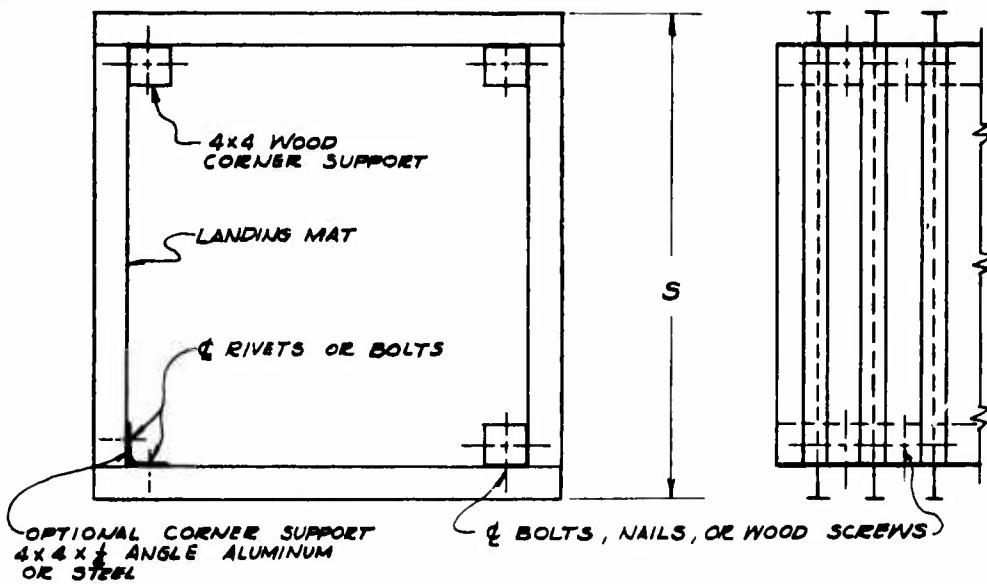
shows the cross section of a form of a box culvert that can be built hurriedly to span drainage systems of widely varying sizes. In many instances this culvert could be used for temporary culverts where the total construction would consist of stacking sand bags for supports and laying landing mat sections for decking for the road bed. Depending upon the size of the drainage ditch to be spanned and on the duration of use, one of the other more permanent forms of support illustrated could be used.
